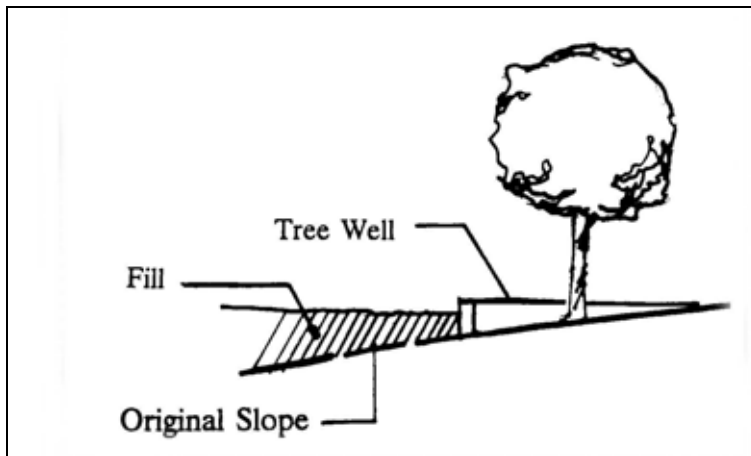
Tree wells protect existing trees in minor cut or fill areas.
